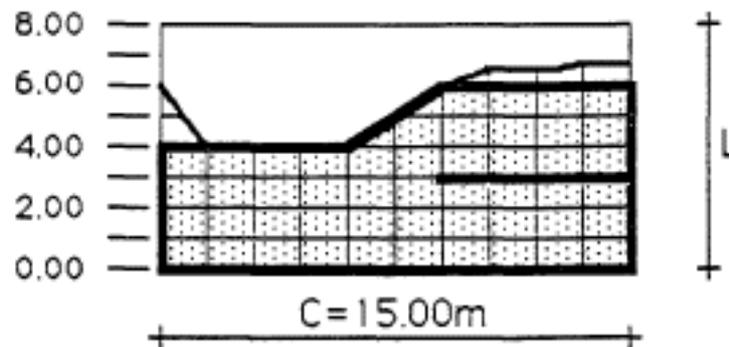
The northern elevation of the highest allowed building at a distance of 8 m south to the collector.
